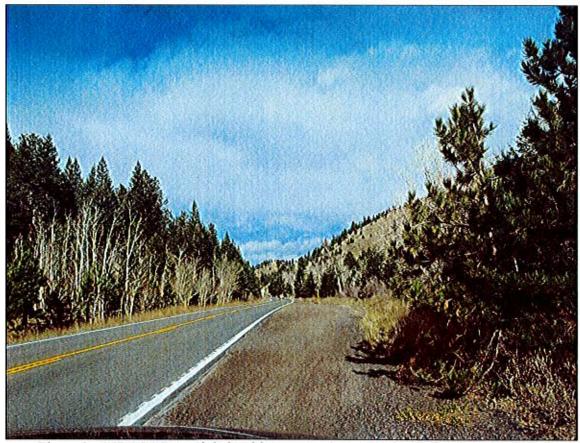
MP 16.1 Potential shoulder use section - Cattle Trail Drive (850 feet)
